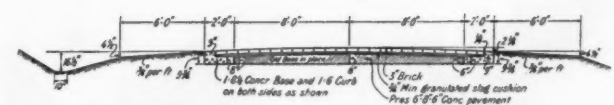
OHIO HIGHWAY DEPARTMENT (Route 3)
